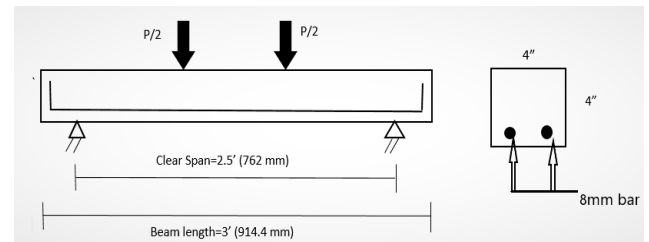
Cross Section of a typical beam used in experiments and loading pattern.
